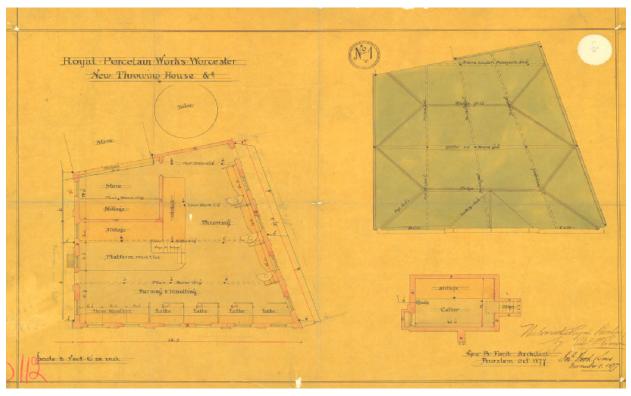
George B Ford's plan for Building E. This shows the ground floor (left), the roof plan (right top) and the cellar plan (right bottom) (source: Worcester Porcelain Museum)
